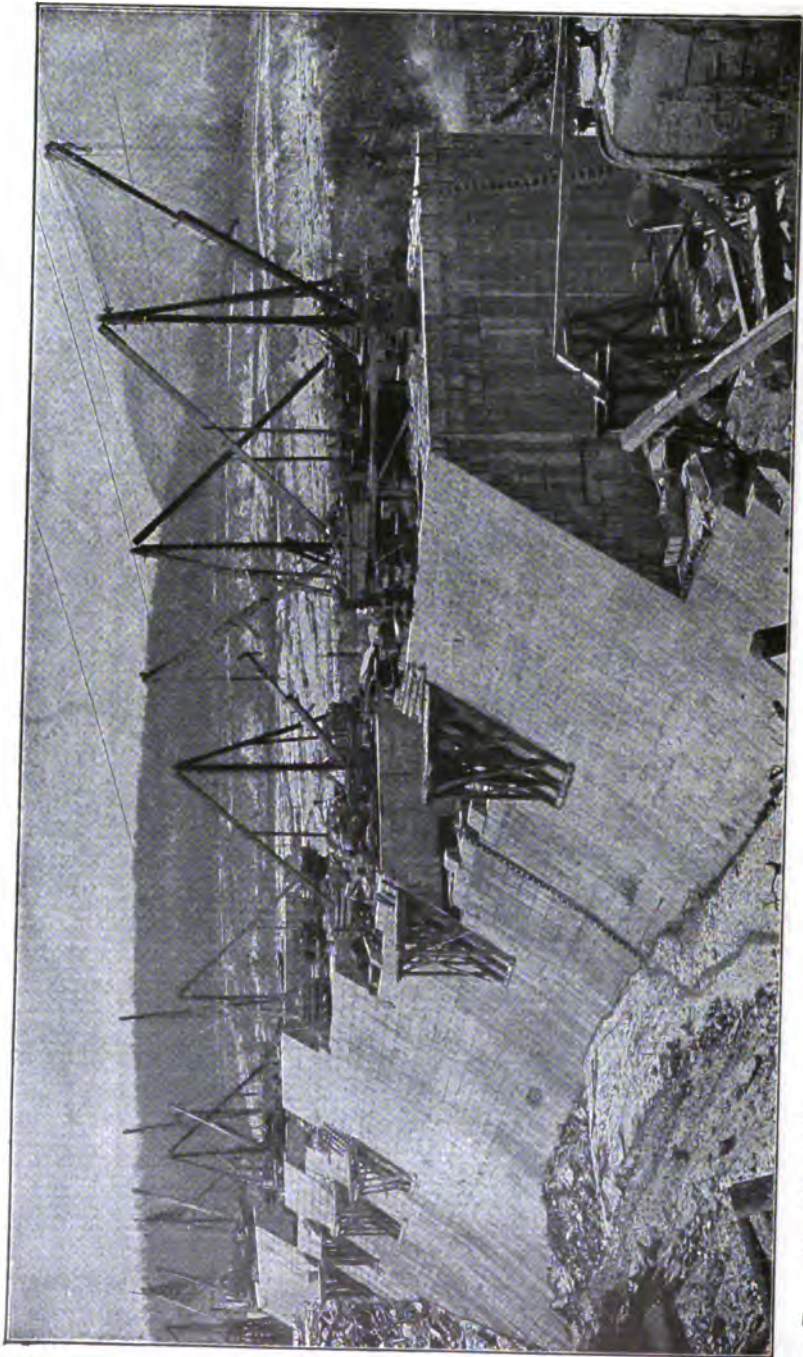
Olive Bridge Dam. Masonry Section of Downstream Face, Showing how Dam was Built in Sections Bonded by Transverse Joints. Shows Derricks and Platform upon which the Cableways Delivered the Masonry.
